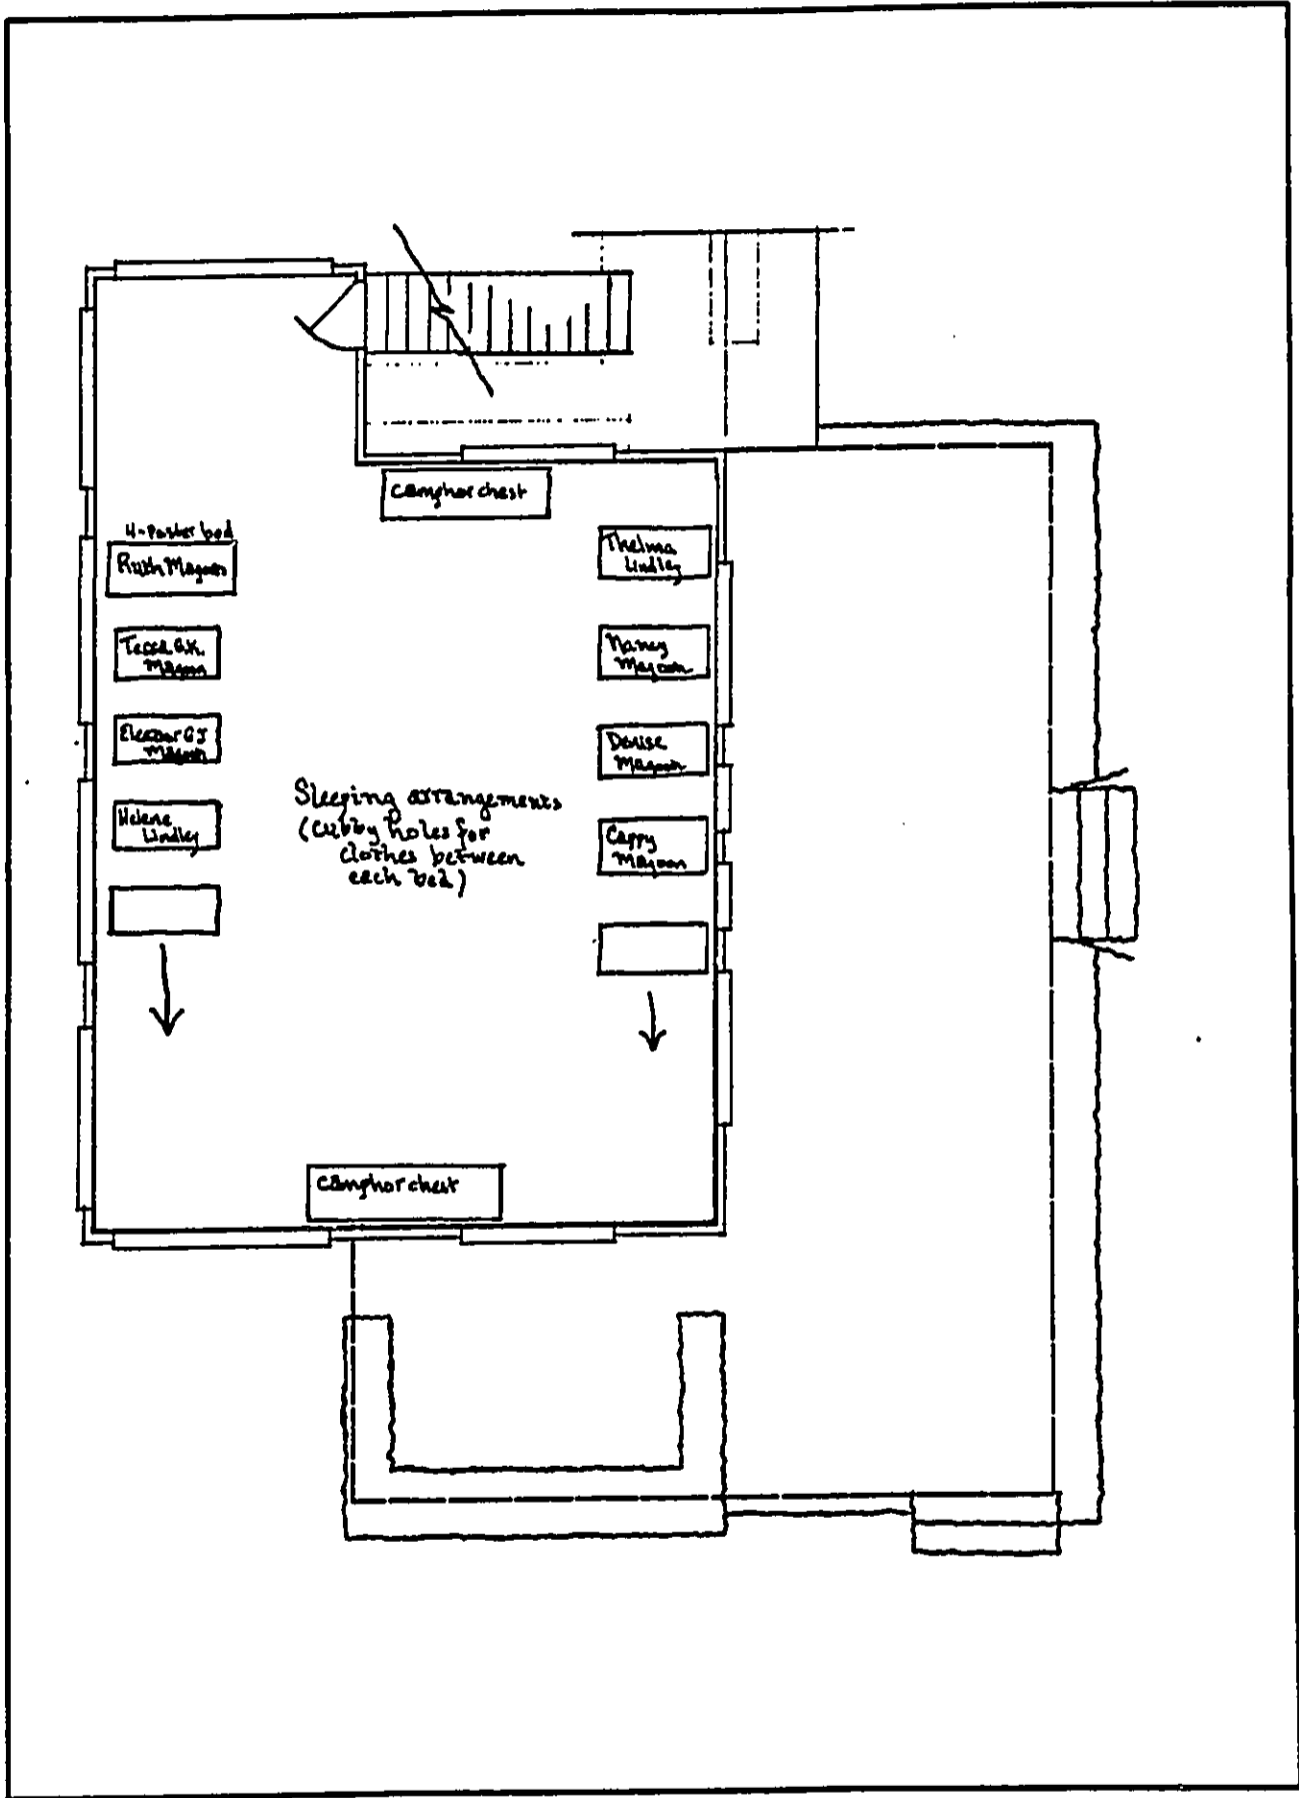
Floor Plan (second floor), Magoon Beach Home at Mahai'ula (ca. 1950s)
